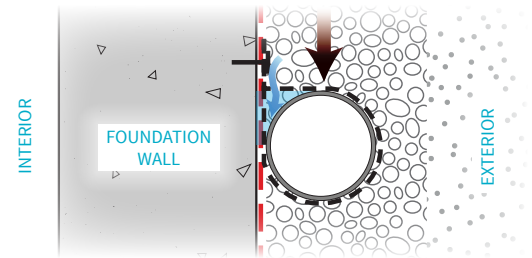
Typical solid rain water leader drain pipe installation method (section view)
